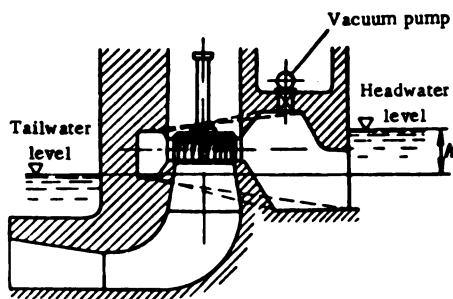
Schematic layout of a siphon-type scroll casing
